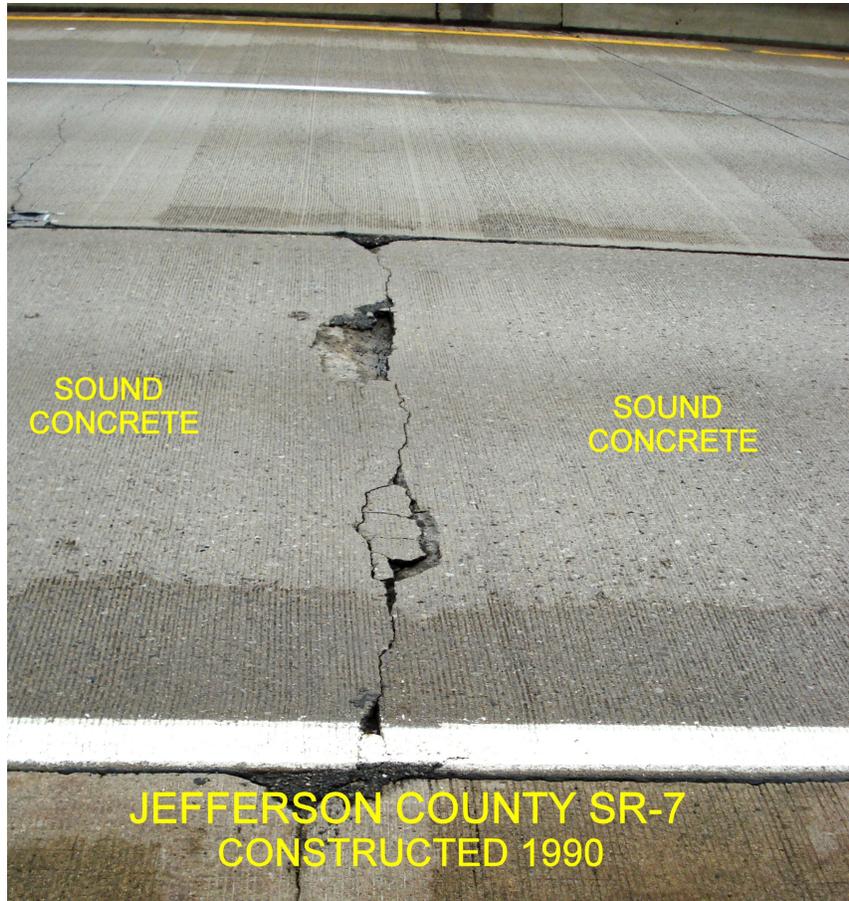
A mid-slab crack on the Jefferson County, Ohio State Route 7 pavement showing Type 3 cracking and spalling distress (Photographed in 2009).
